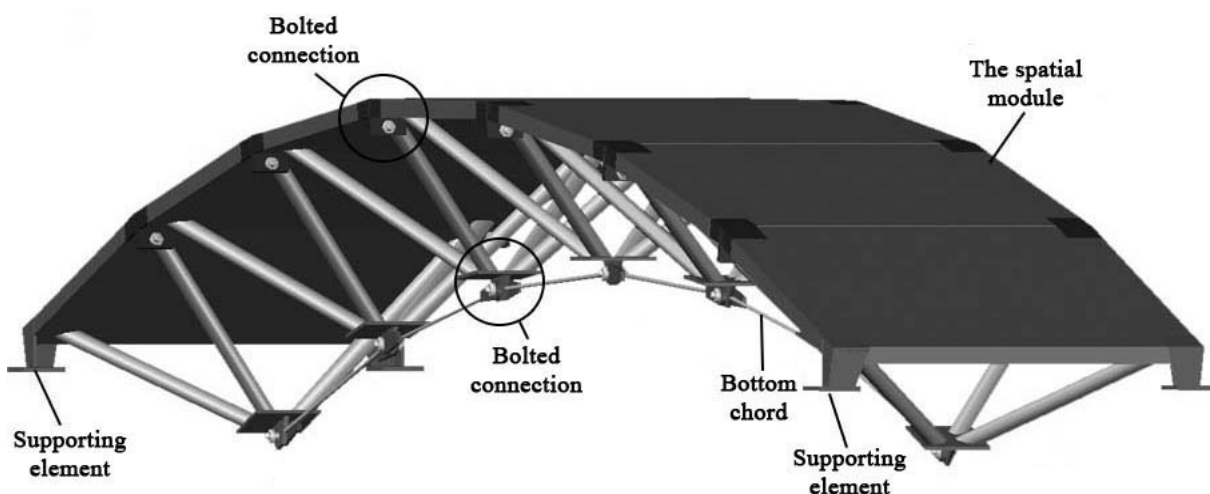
The section of the spatial grid-cable steel-concrete composite shell
